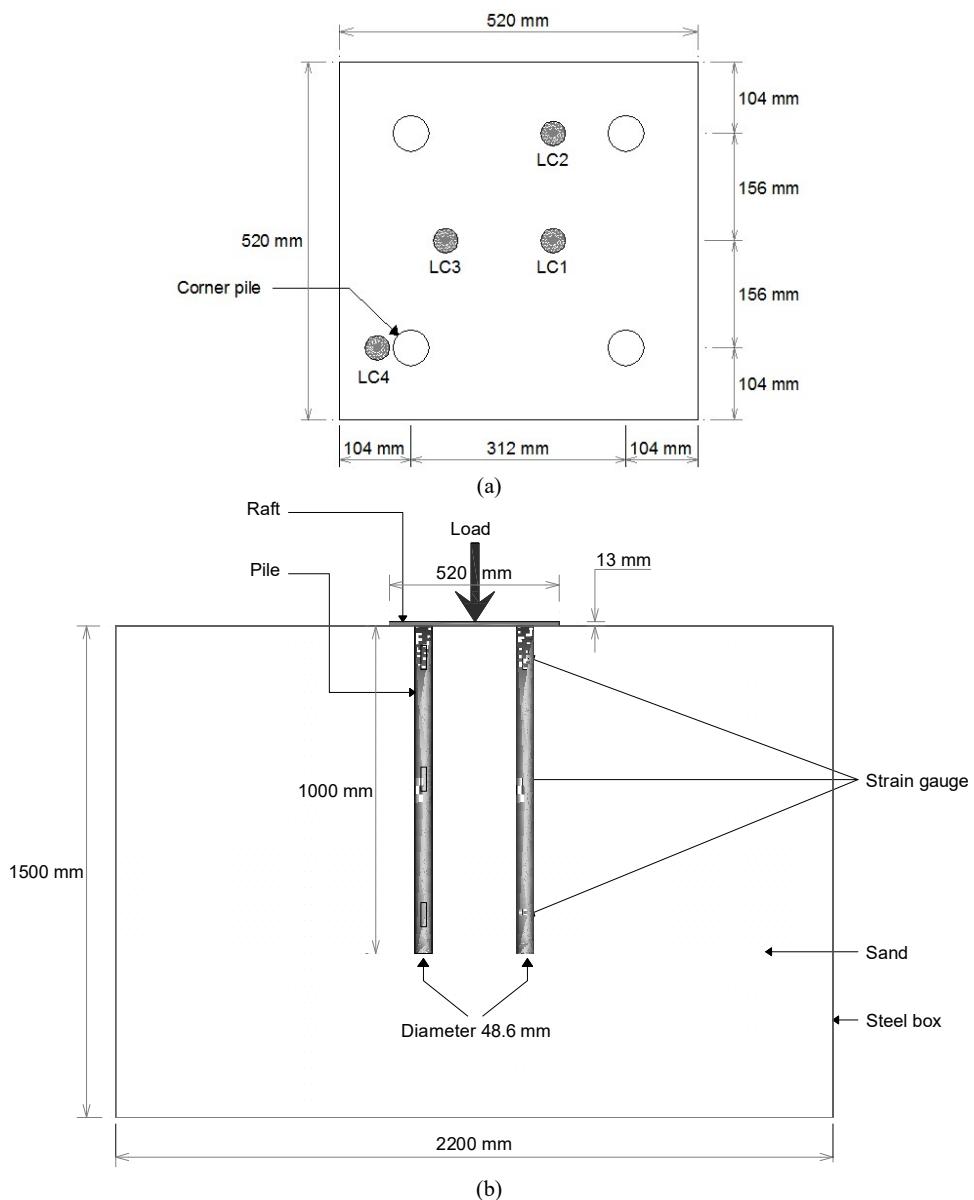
Schematic diagram of laboratory 2x2 group piled-raft model: (a) Plan view; (b) Cross section view
